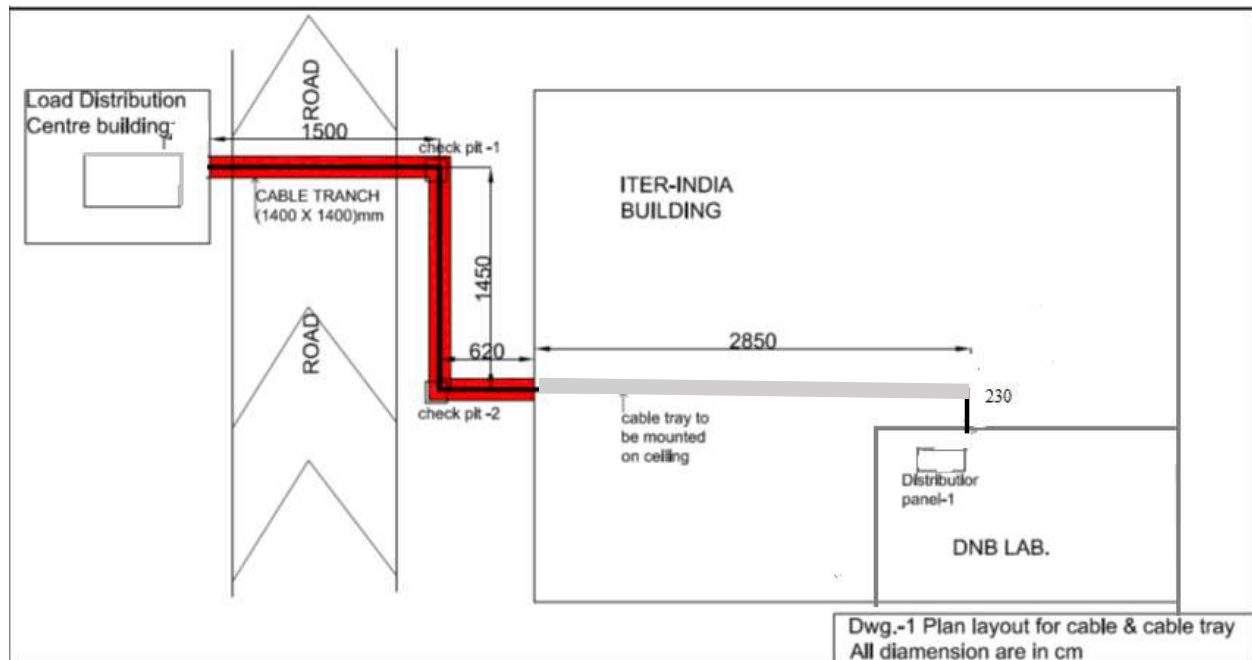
Plan view of cable route from Load distribution centre building to DNB lab, ITER India Lab Building with trench route highlighted in dark. The area highlighted in light grey is the portion for which cable tray of appropriate size has to be laid.
